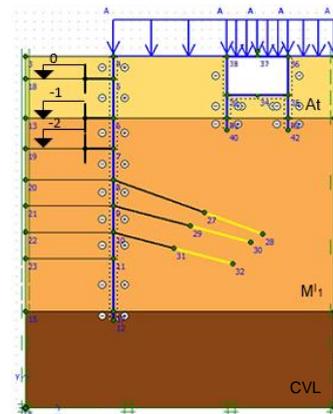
Cross sections in the DE elevation, transverse to the tunnel of the Marquês located on the surface
